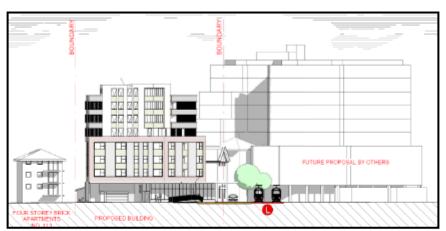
Excerpt North Elevation Plan indicating building height consistent and subservient to proposed development at No. 177 – 197 Anzac Parade (DA/20/2021)
